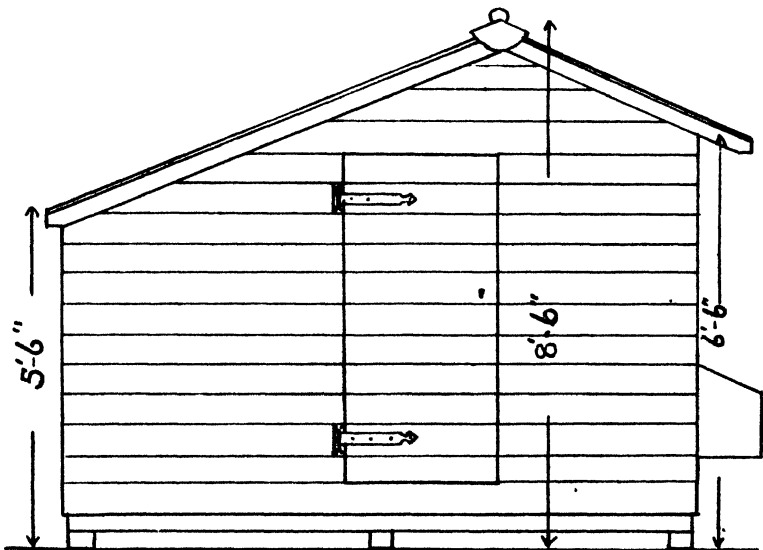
Section and End Elevation of Poultry House—Colony Method (No. 2).
